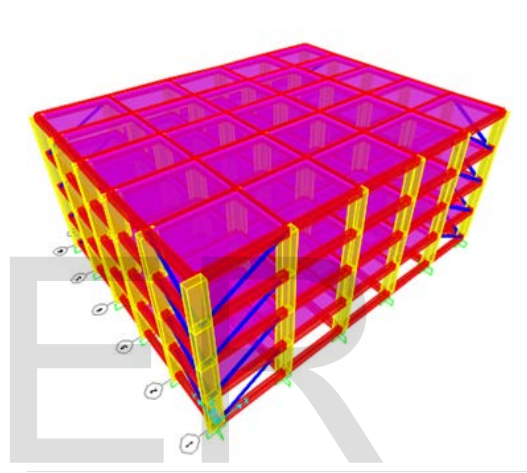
Model 1F of Building with BRB (single diagonal) at corner location
